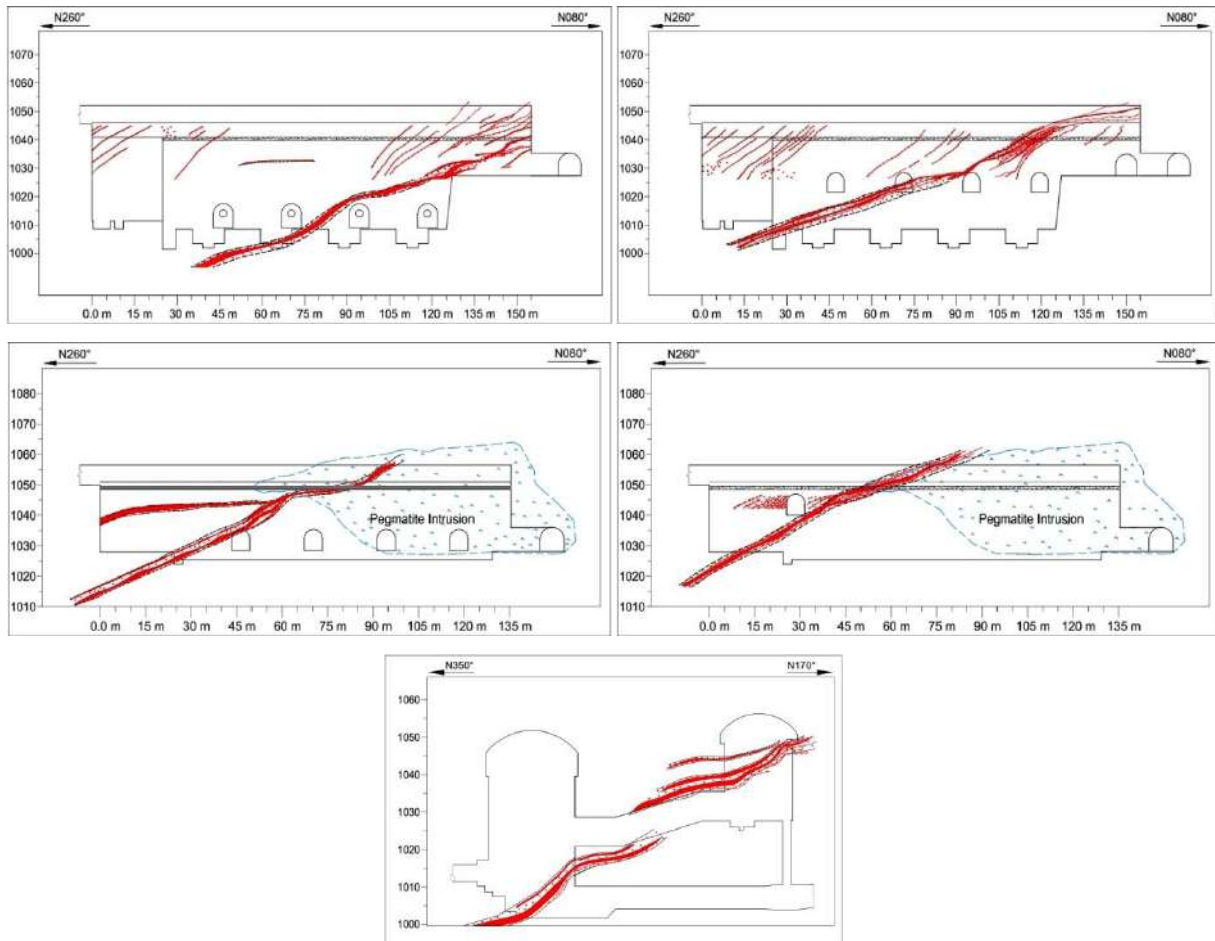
Geological section showing disposition of shear zone along (a) upstream wall (b) downstream wall of power house cavern (c) upstream wall (d) downstream wall of transformer hall cavern (e) across the caverns.
